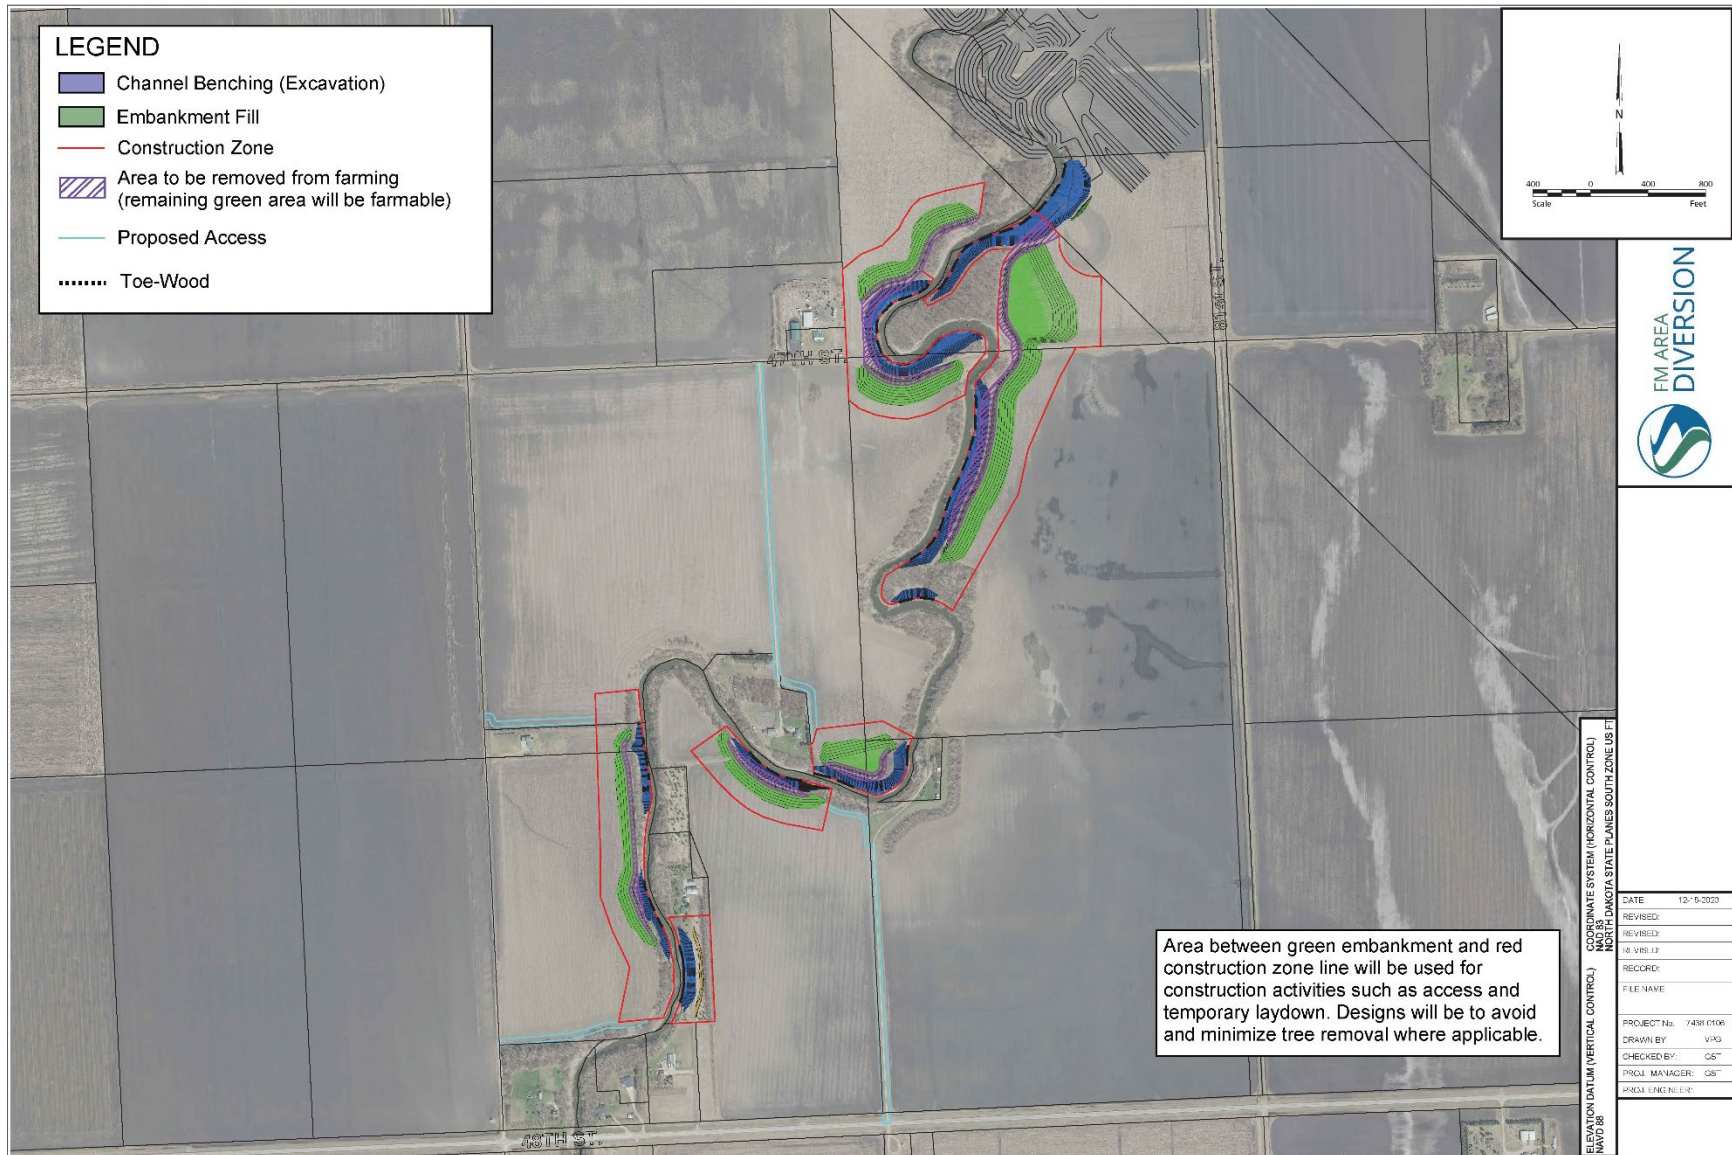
Sheyenne River Proposed Alternative Benching Overview
